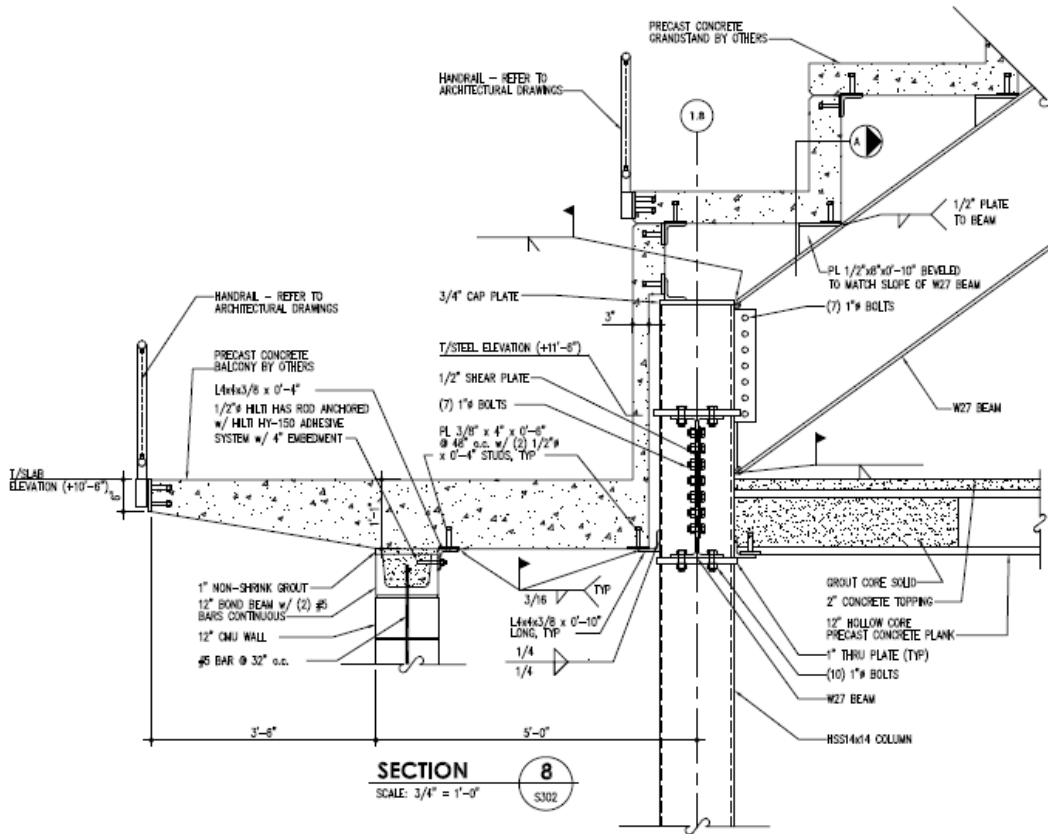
Section Showing the 12” Hollow Core Precast Concrete Planks, the Precast Concrete Balcony, and the W27x94 Beams Supporting the Concrete Grandstand
